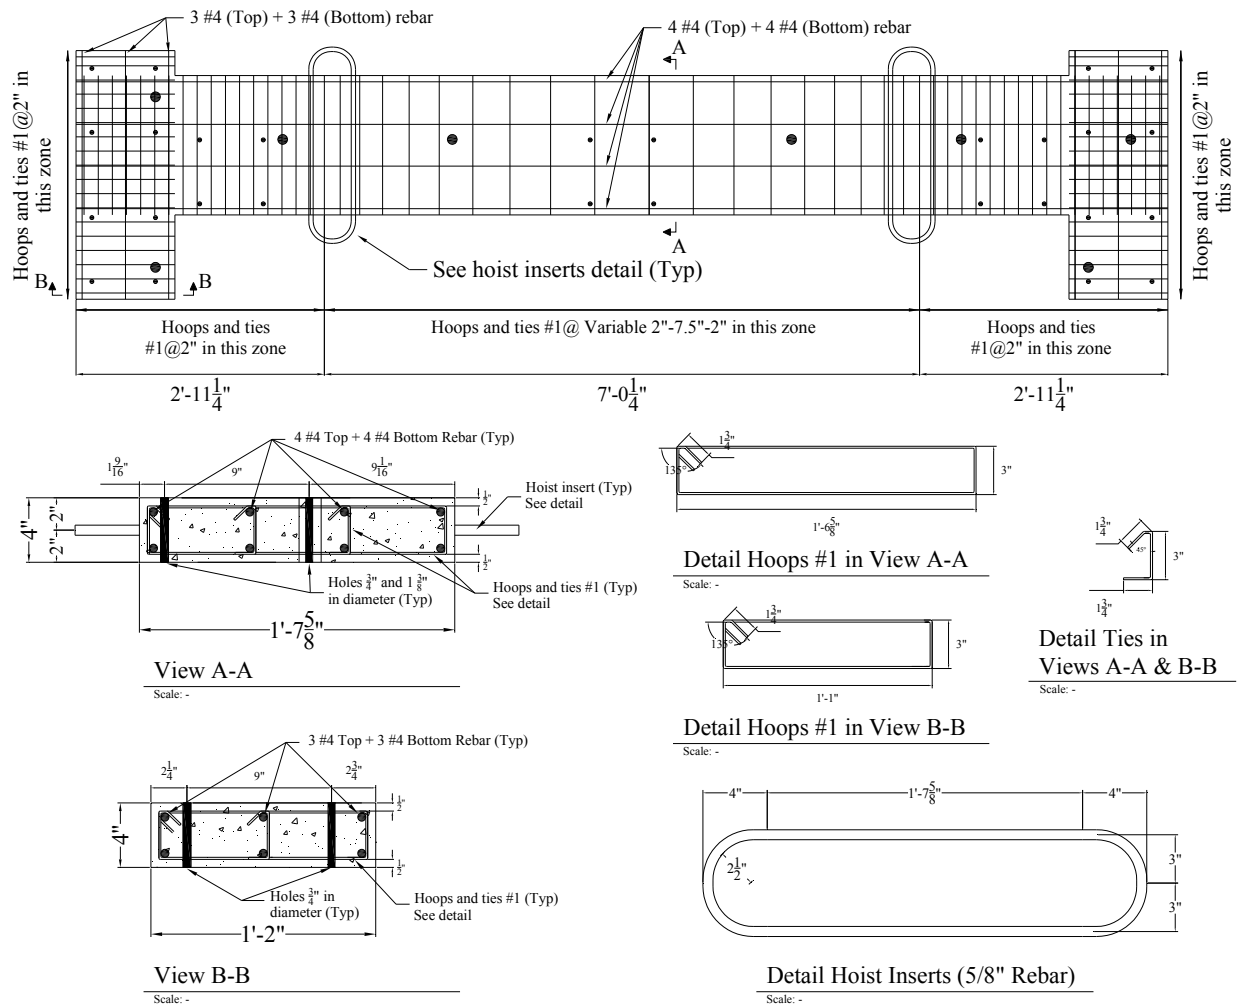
Concrete Slab used as Boundary Elements for Test Specimens
